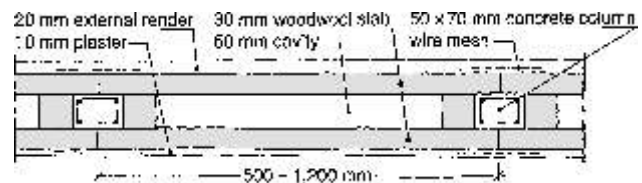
Wall of vertical (or horizontal) elements consisting of two woodwool slabs sandwiching spacer strips of woodwool slab. The elements are joined by in-situ cast columns of reinforced concrete. (Using 30 mm thick woodwool slabs gives a U-value of 0.9 W/m²K).
